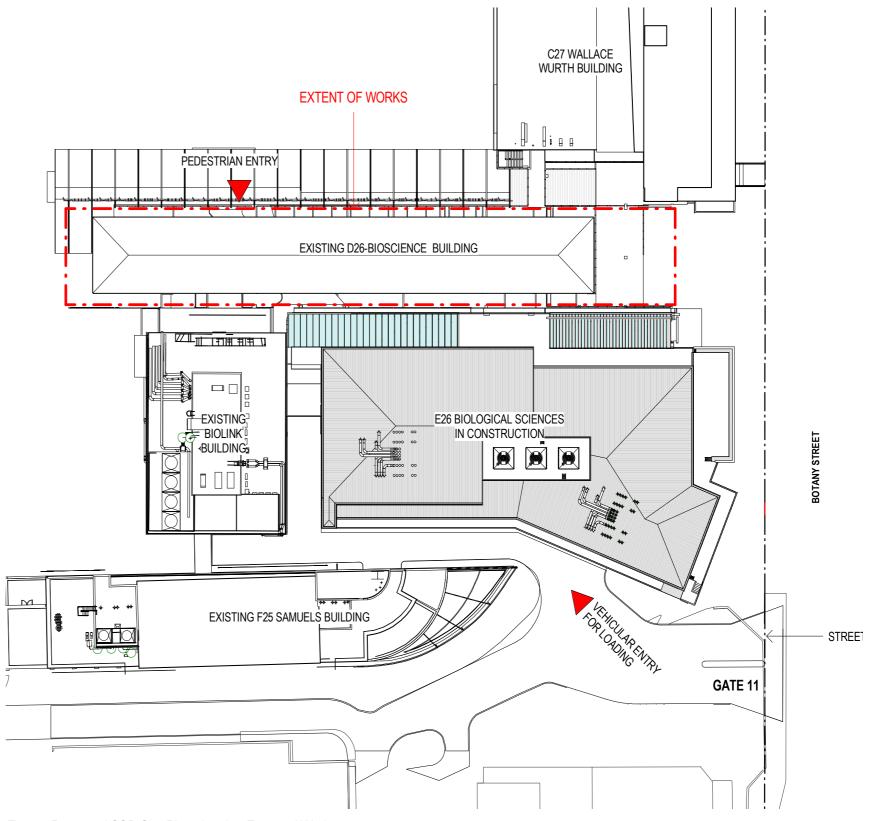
Proposed SSD Site Plan showing Extent of Work
